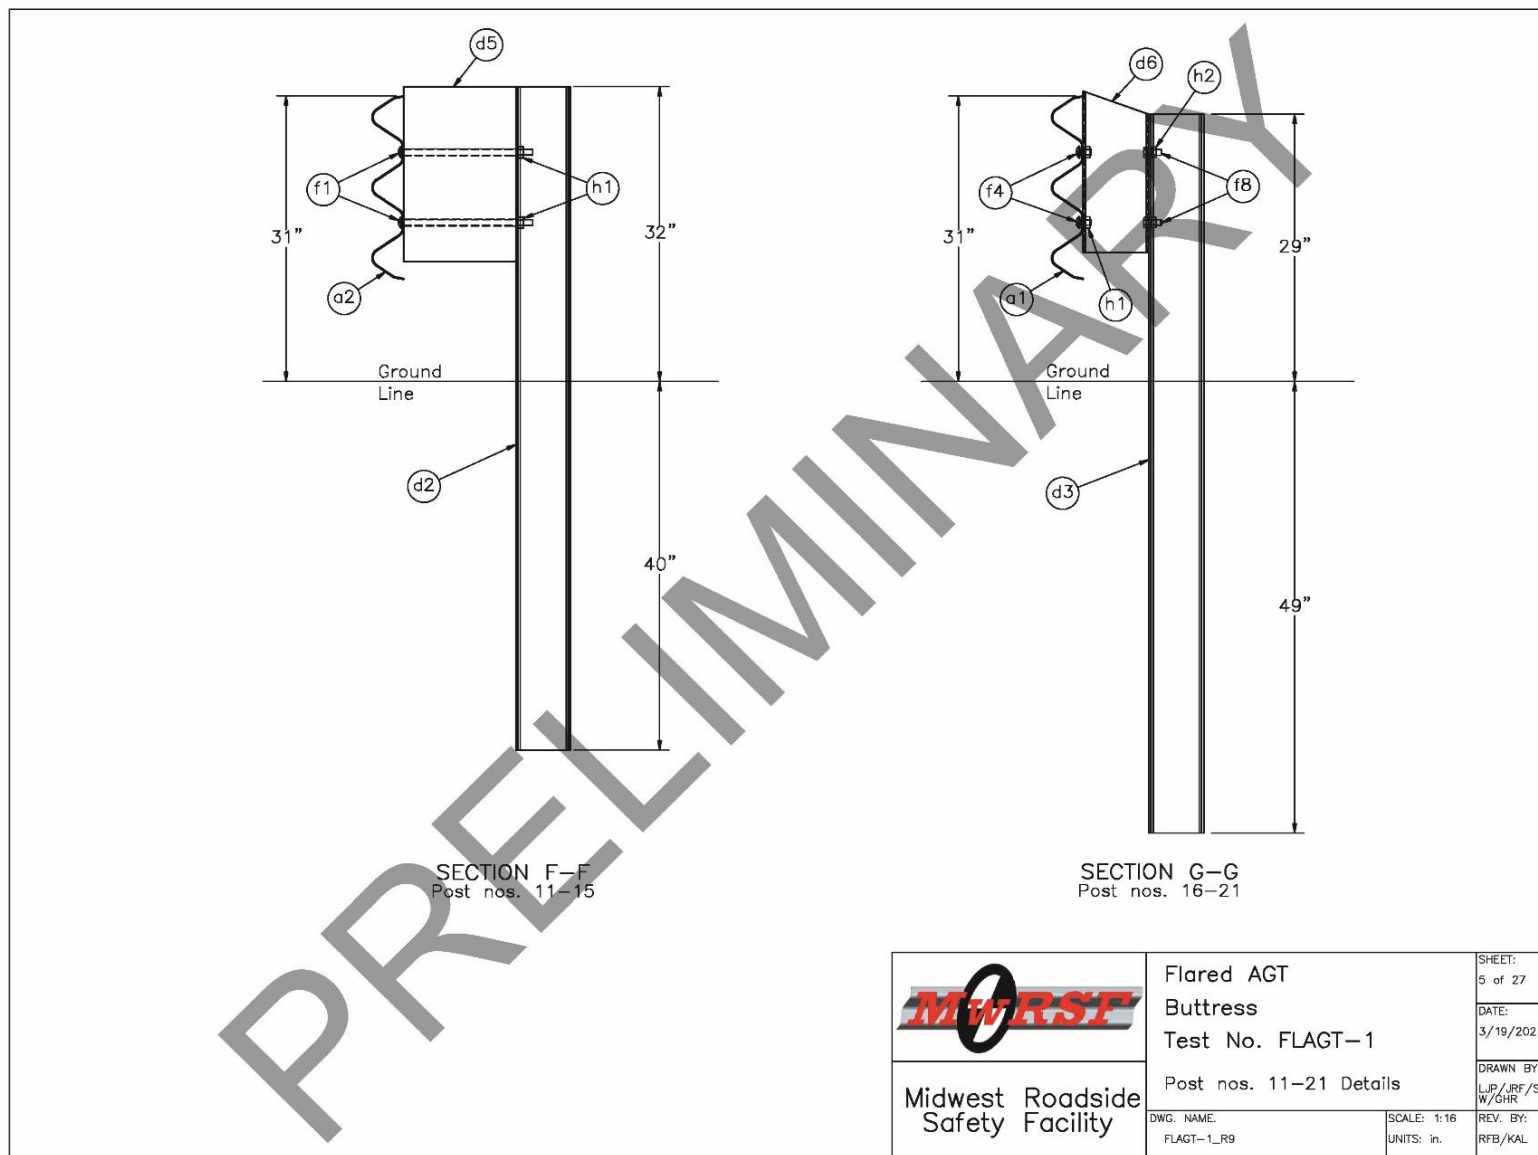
Post Nos. 11-21 Details, Test No. FLAGT-1
